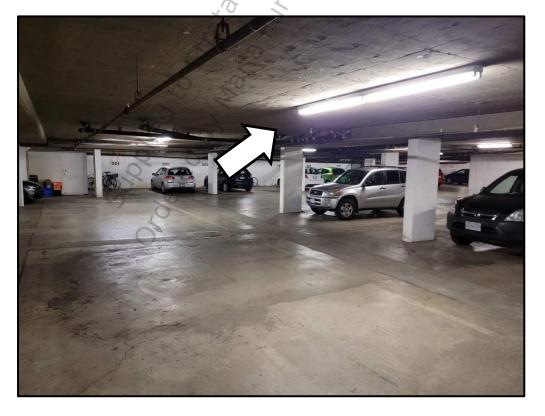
(D50 20 02.04) - Soffit-Mounted Light Fixtures in Parkade
